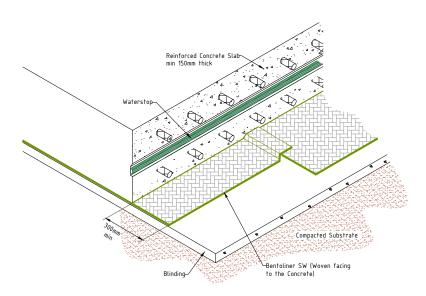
BentoLiner® SW installed over concrete blinding or earth/gravel substrate requires a minimum 150 mm thick reinforced slab
